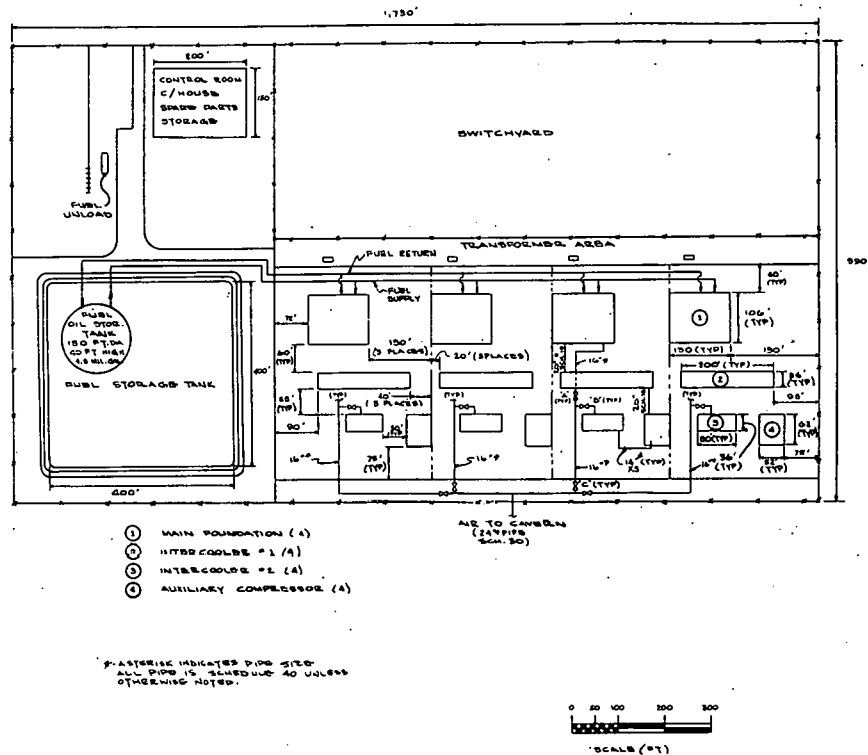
Balance of Plant Layout at 600 MWe 40 Atmosphere Working Pressure
